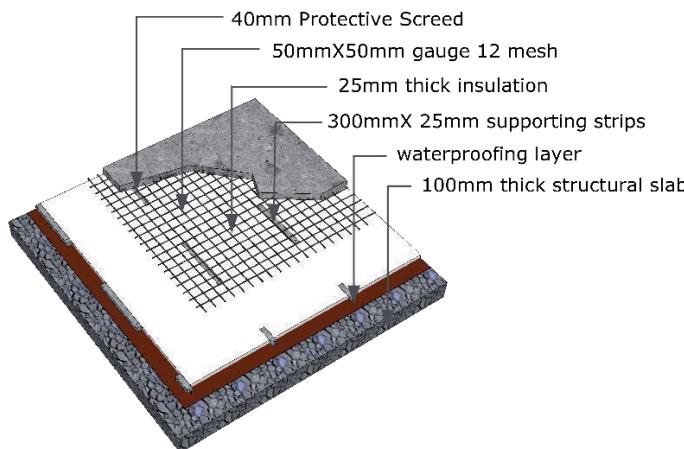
, Newly designed roof slab insulation system (Kasun Nandapala & Halwatura, 2016)
